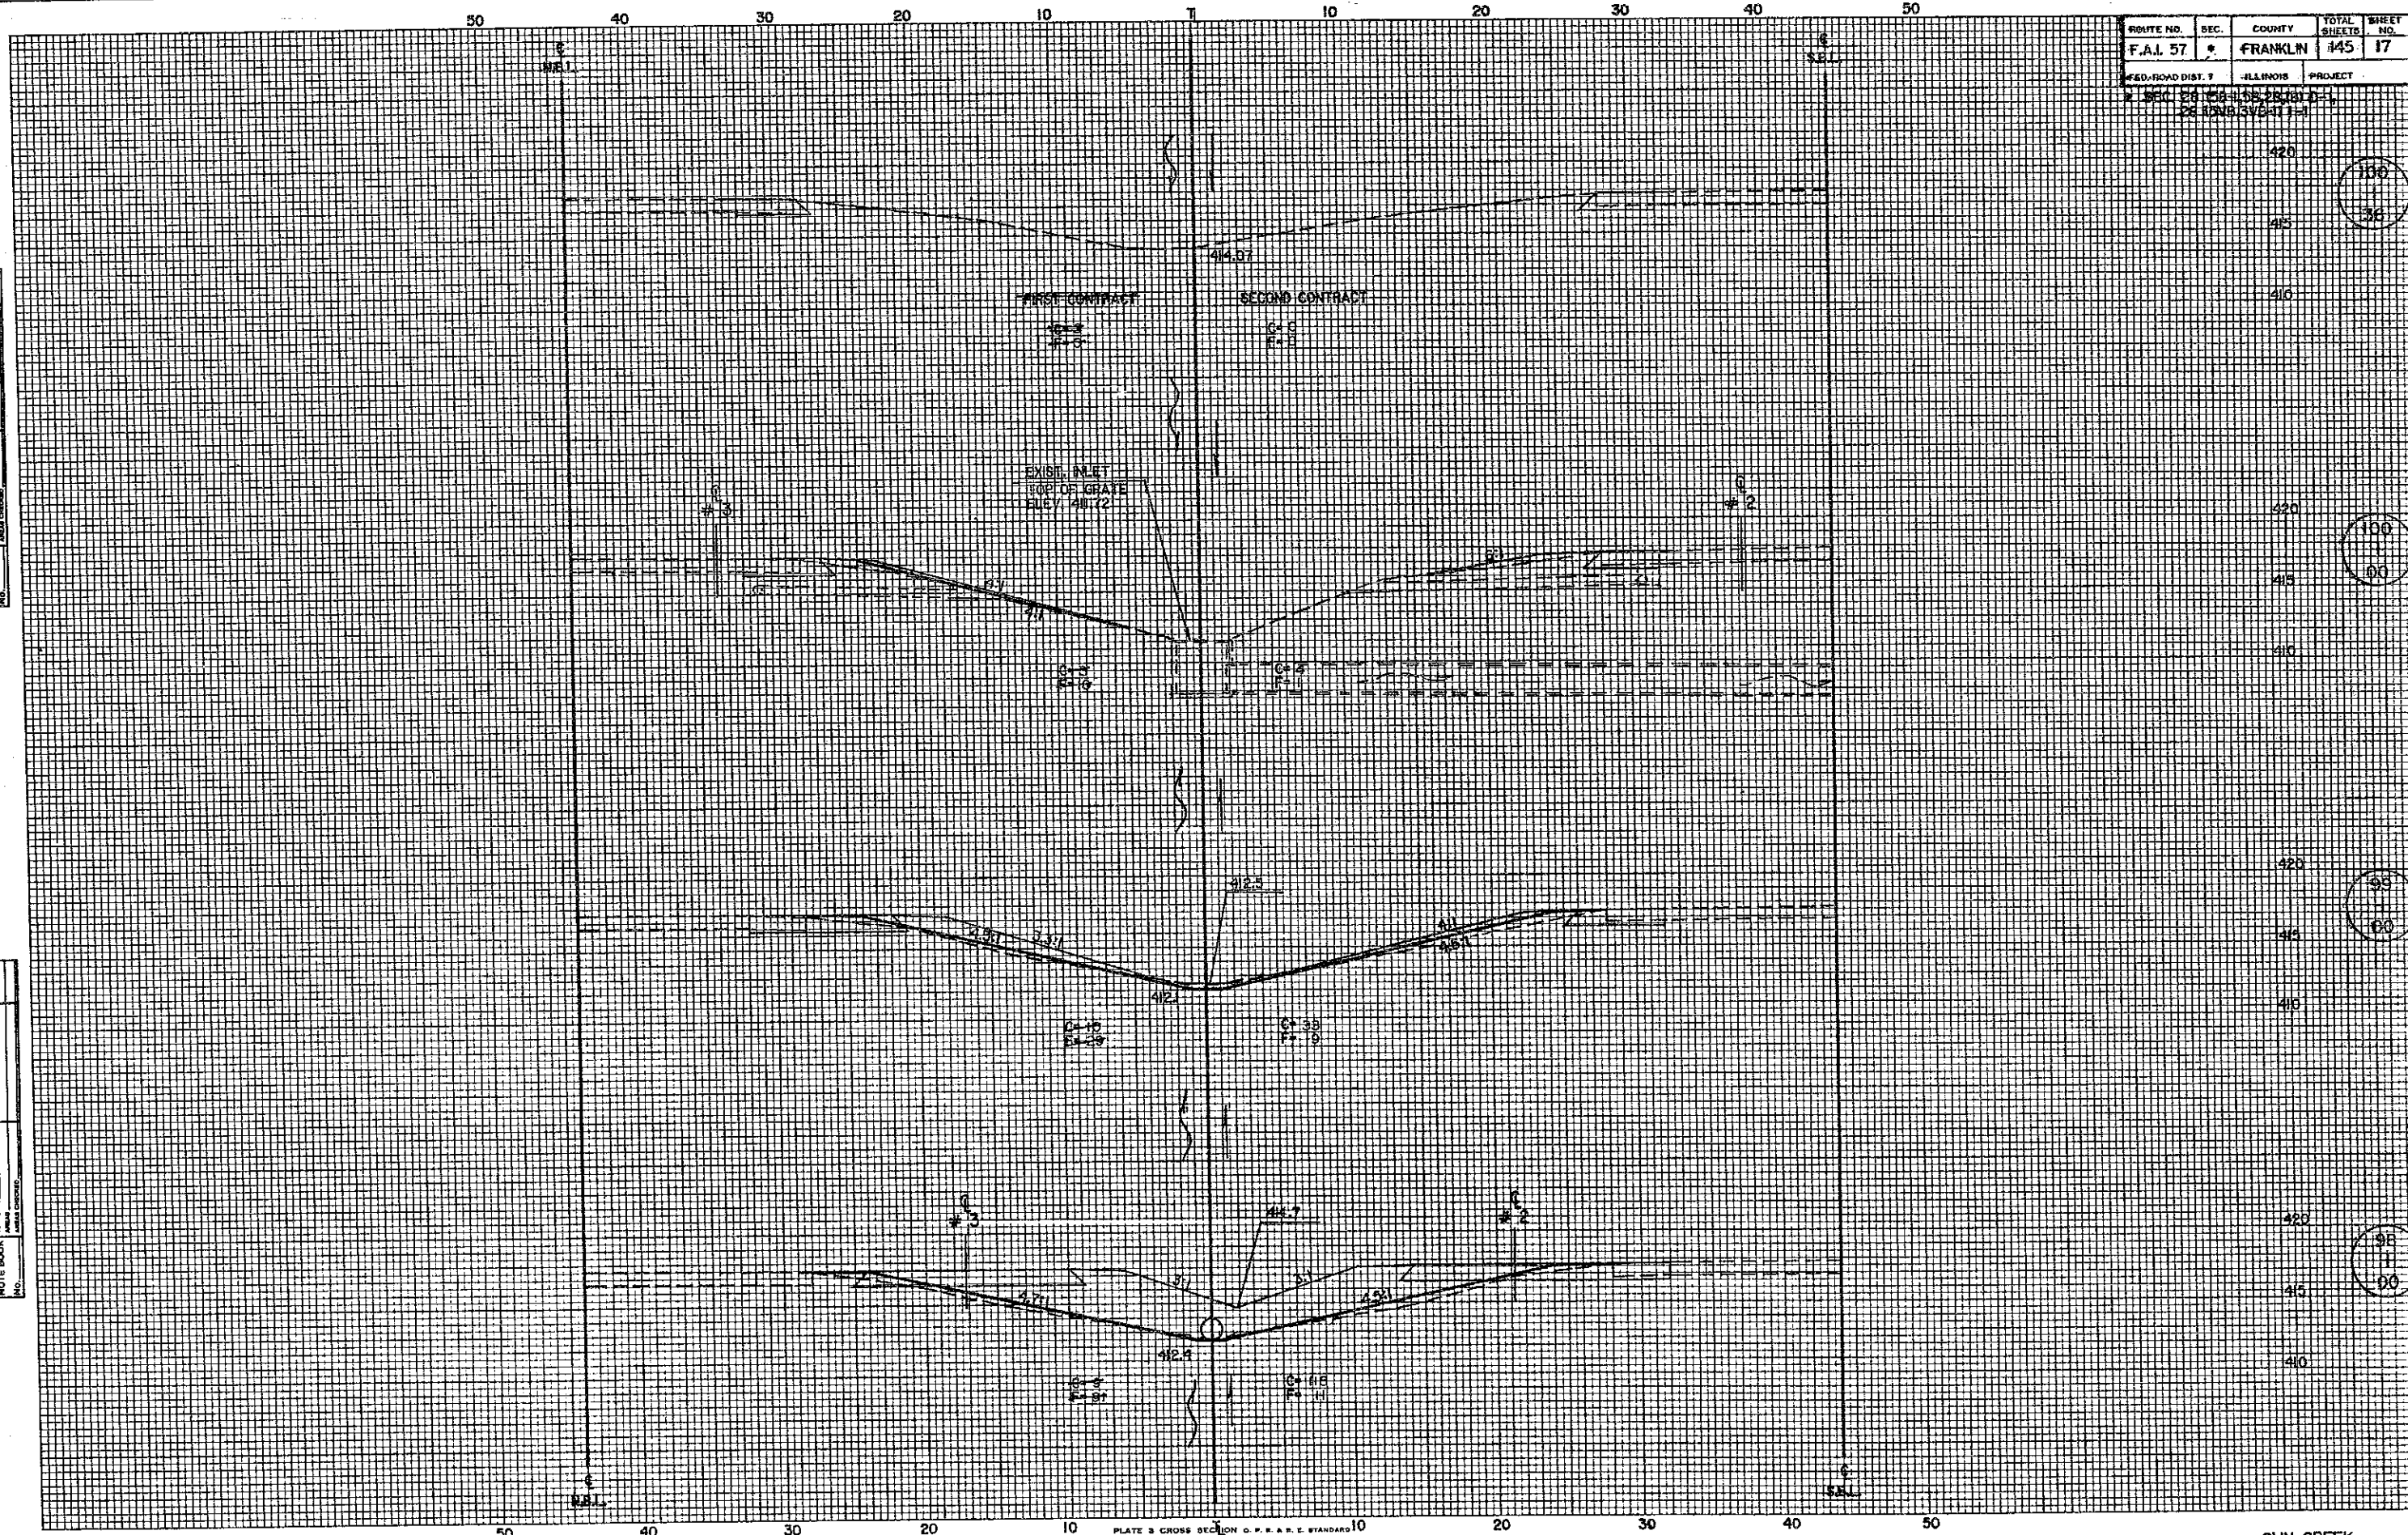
CROSS SECTION D. P. & S. STANDARDS 10
